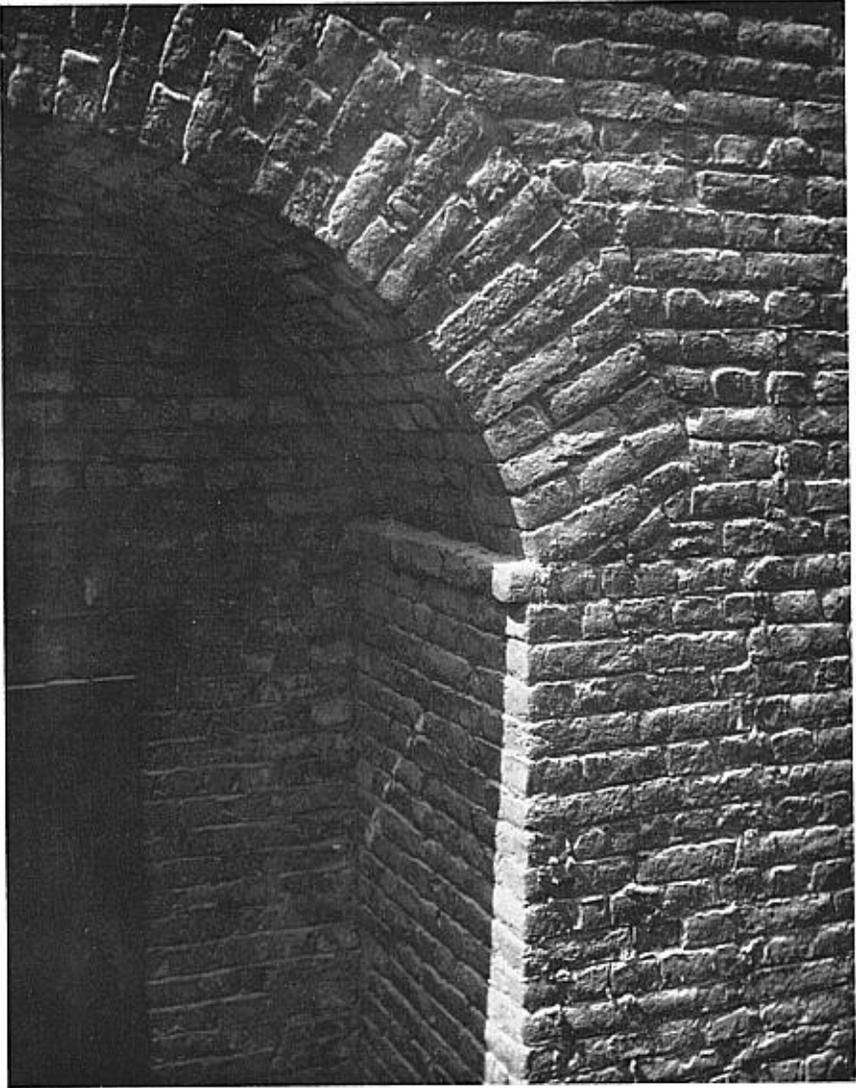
DETAIL OF THE NORTH WALL ARCH AND IMPOST
